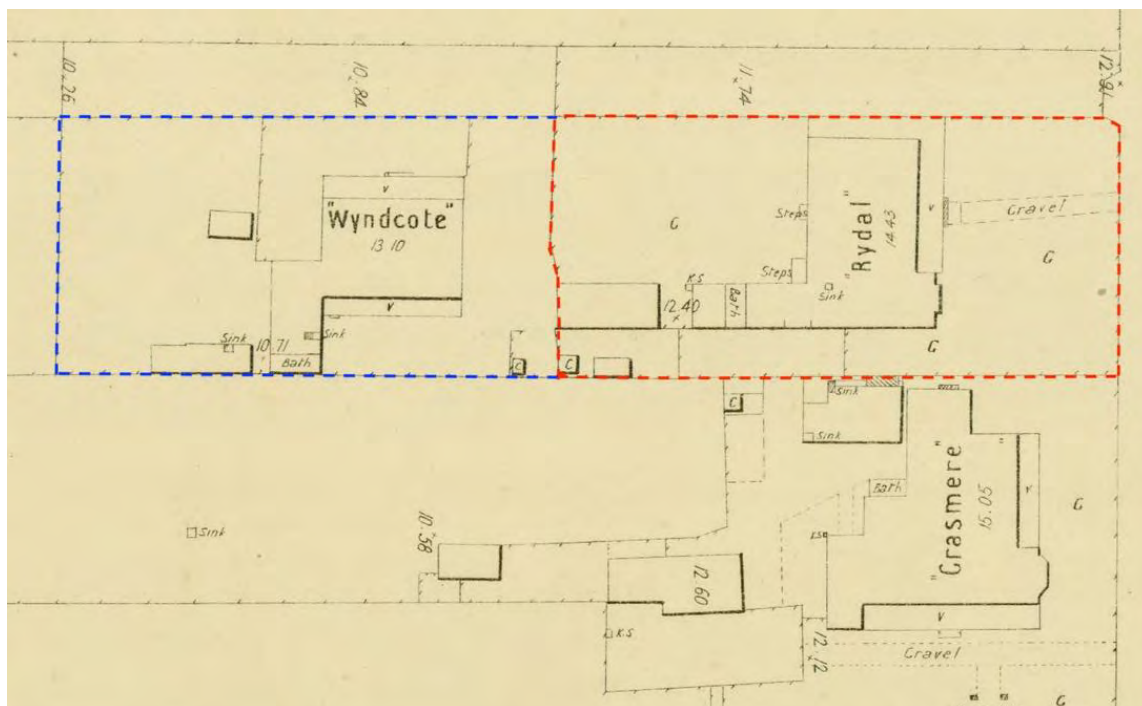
1905 Plan (detail) showing plan of 87 Tennyson Street Elwood and neighbouring Grasmere. The boundaries of Wyndcote are highlighted with a blue dotted line and the boundaries of Rydal including the common boundary with Rydal are highlighted with a red dotted line. Source: State Library of Victoria, Melbourne Metropolitan Board of Works, detail plan no. 1400, 1905.
